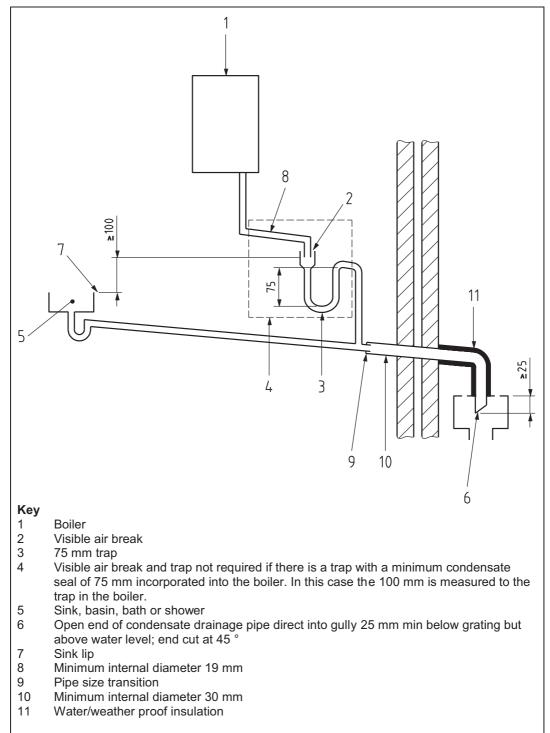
(a) – Connection of a condensate drainage pipe downstream of a sink, basin, bath or shower waste trap
